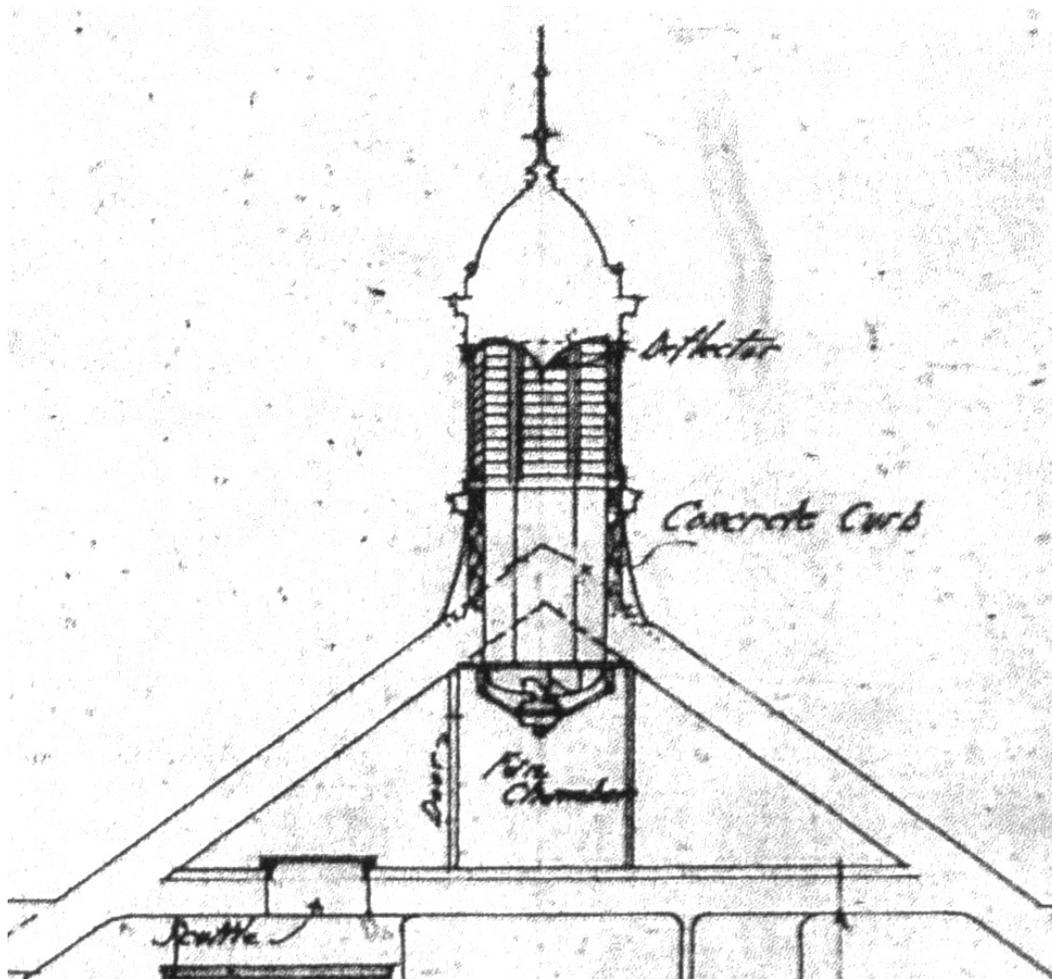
Detail of mechanical fan, Naval Hospital Washington, Washington, DC, 1903 (NARA College Park, RG 71 521-31).
